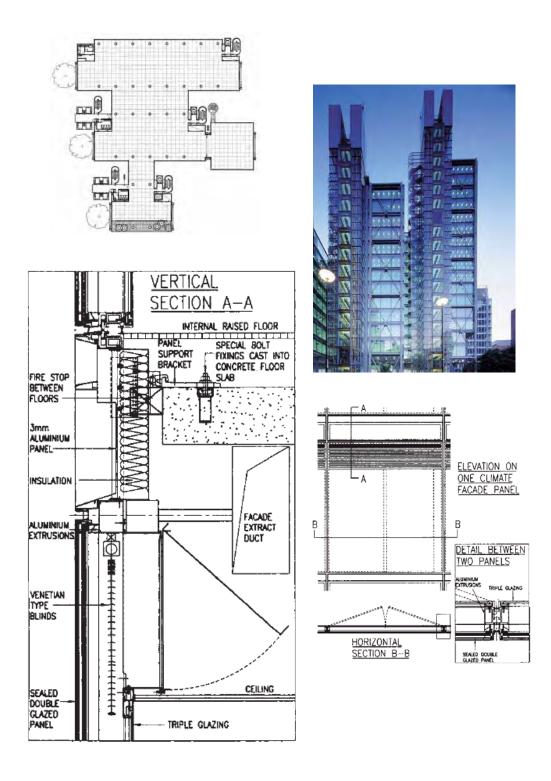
88 Wood Street. Up: Plan and View of the building. Down: Sections, Elevation and Detail of the facade. (Smith, 2005)
